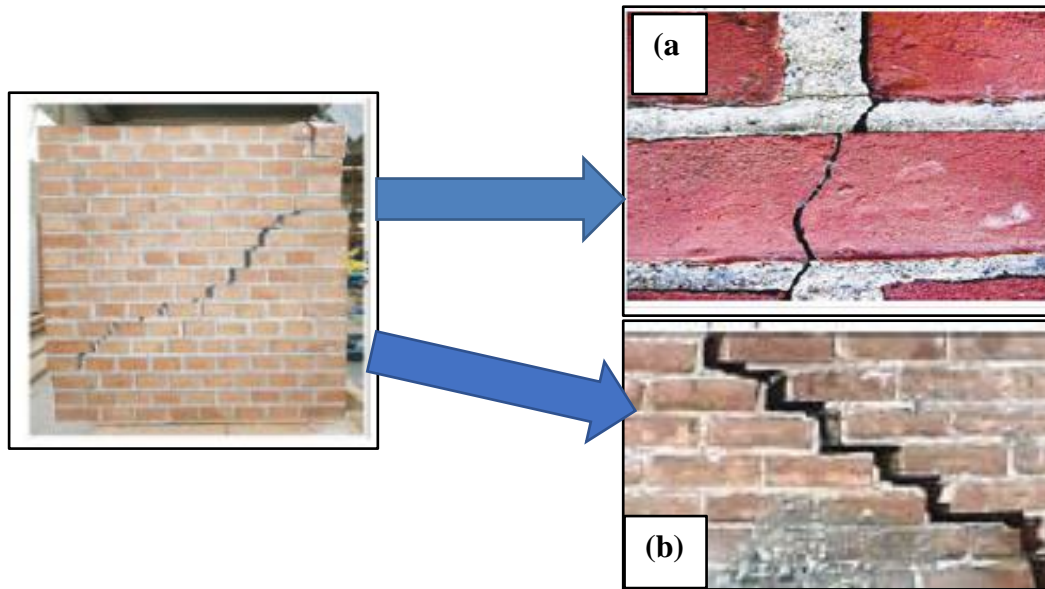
real photo of shear failure of URM wall:( a) diagonal cracking;(b) stepped cracking
